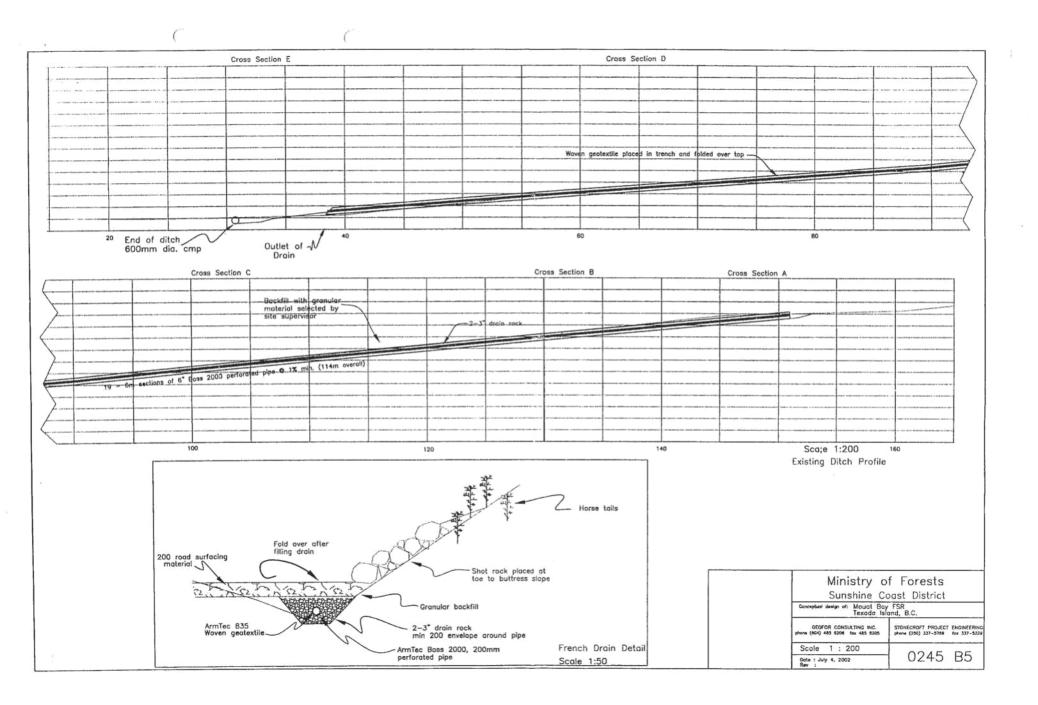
Detail Design Site 1 FSR 5829 Branch 01 Mauat Bay
